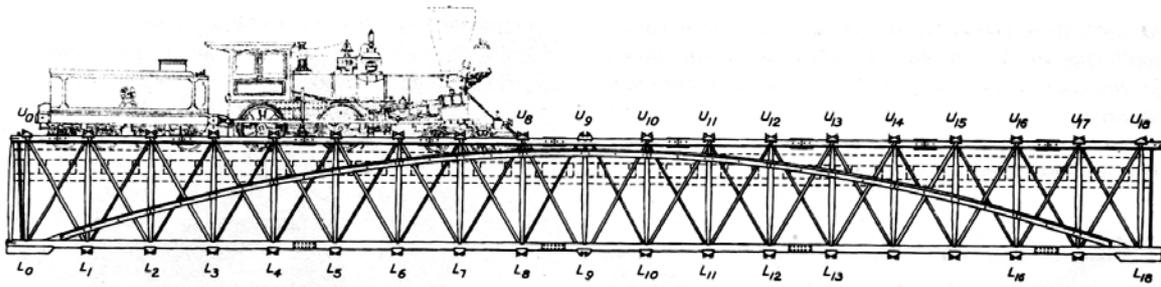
Haupt truss, Herman Haupt, patent design 1839. (James²)
